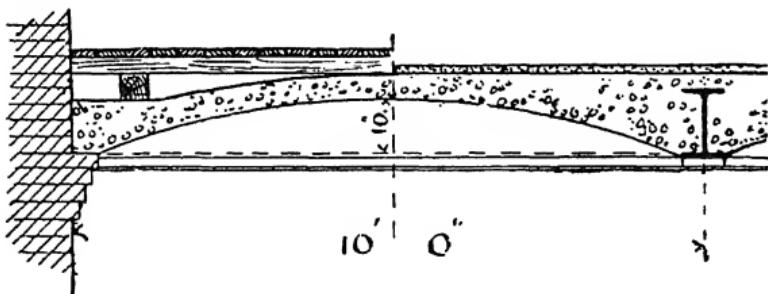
Dennet and Ingle's Arched Concrete Floor.
